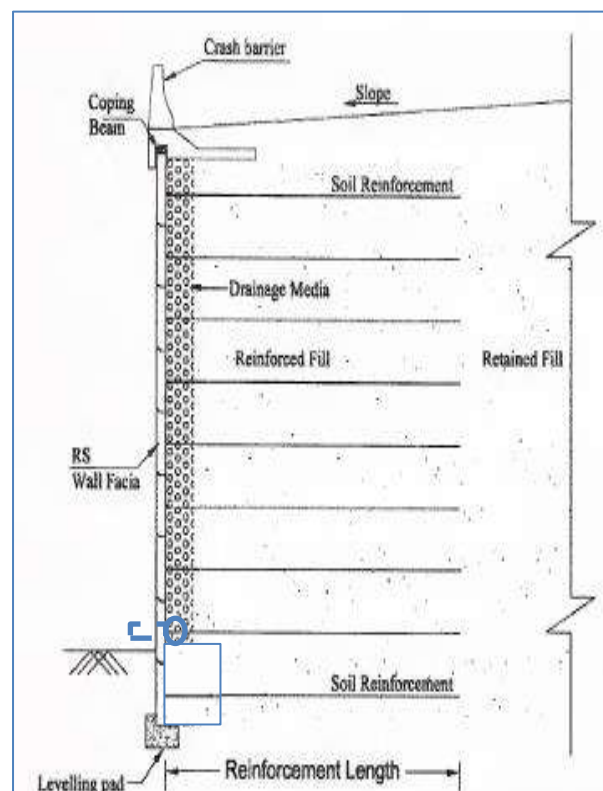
Typical Cross Section of RS Wall with Concrete Panel Facia
